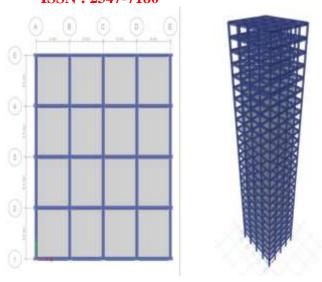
PLAN VIEW OF REGULAR STRUCTURE FIG 3 3D VIEW
